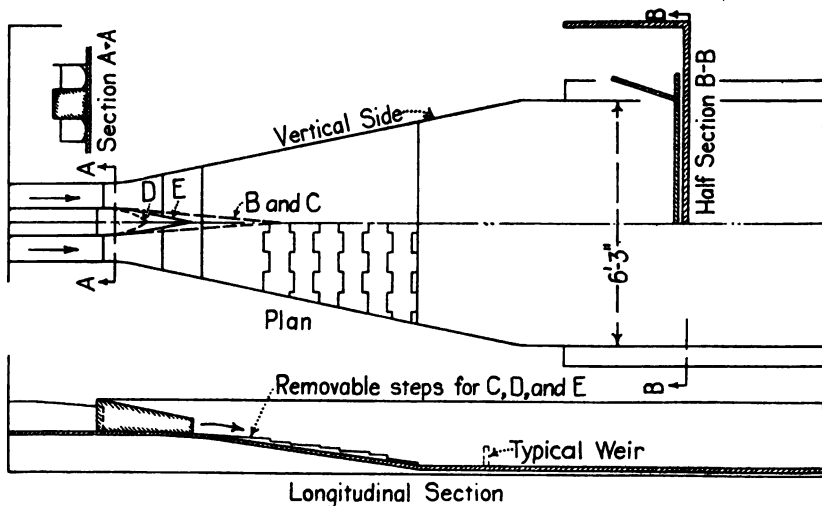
PLAN AND SECTIONS OF SECOND MODEL OF GERMANTOWN DAM OUTLET, SERIES B TO E, FLOOR STEEPER AND ROUGHENED.
